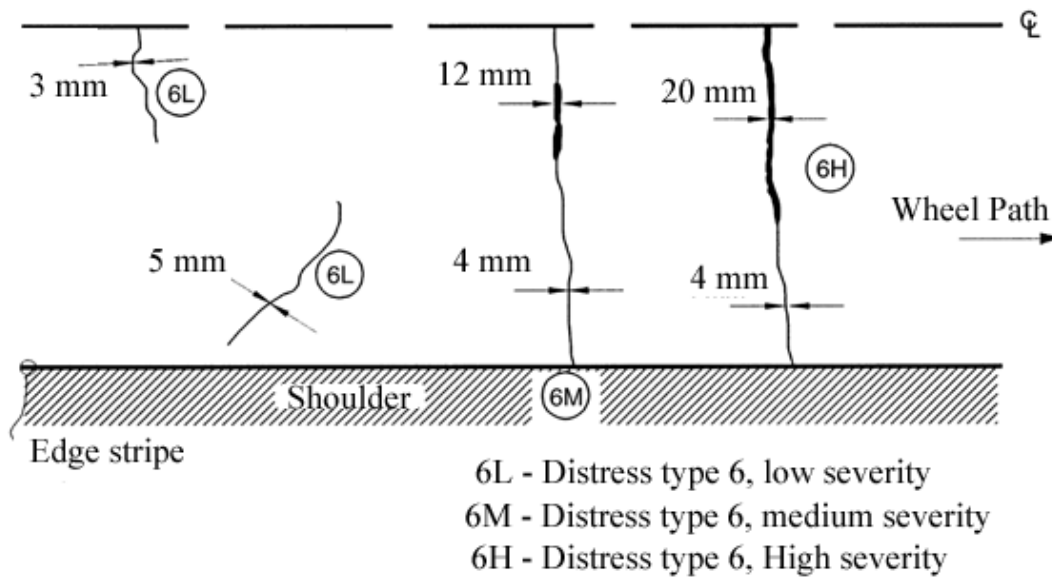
Transverse cracking cross-section (modified from Miller and Bellinger 2014)
